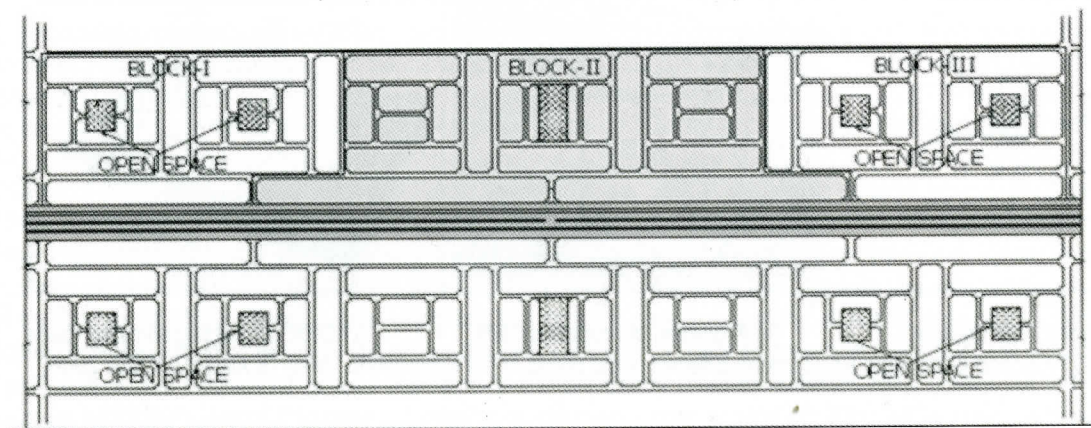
Conceptual layout of neighbourhood and block in the proposed Outer Ring Road project [Source: Welink, 2005]
